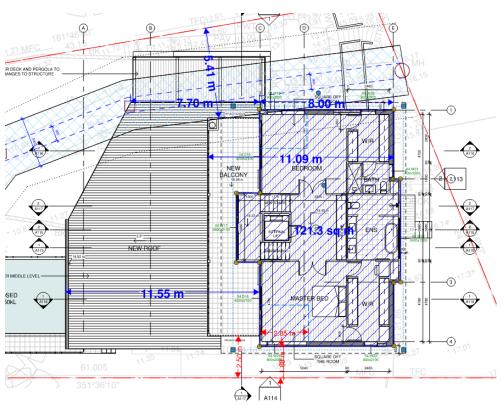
proposed floorplate of the upper building level; the floor plate is approx. 8m deep and 121m² in area
